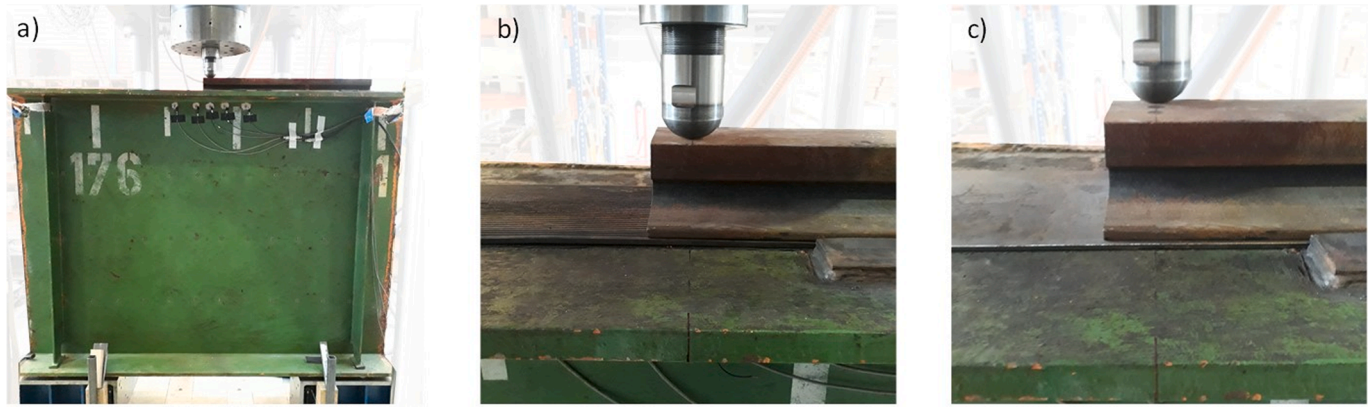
a) Test girder and rail with orthogonal joint in testing machine, b) rail with orthogonal joint on elastomeric bearing pad, c) rail with orthogonal joint on steel bearing plate.
